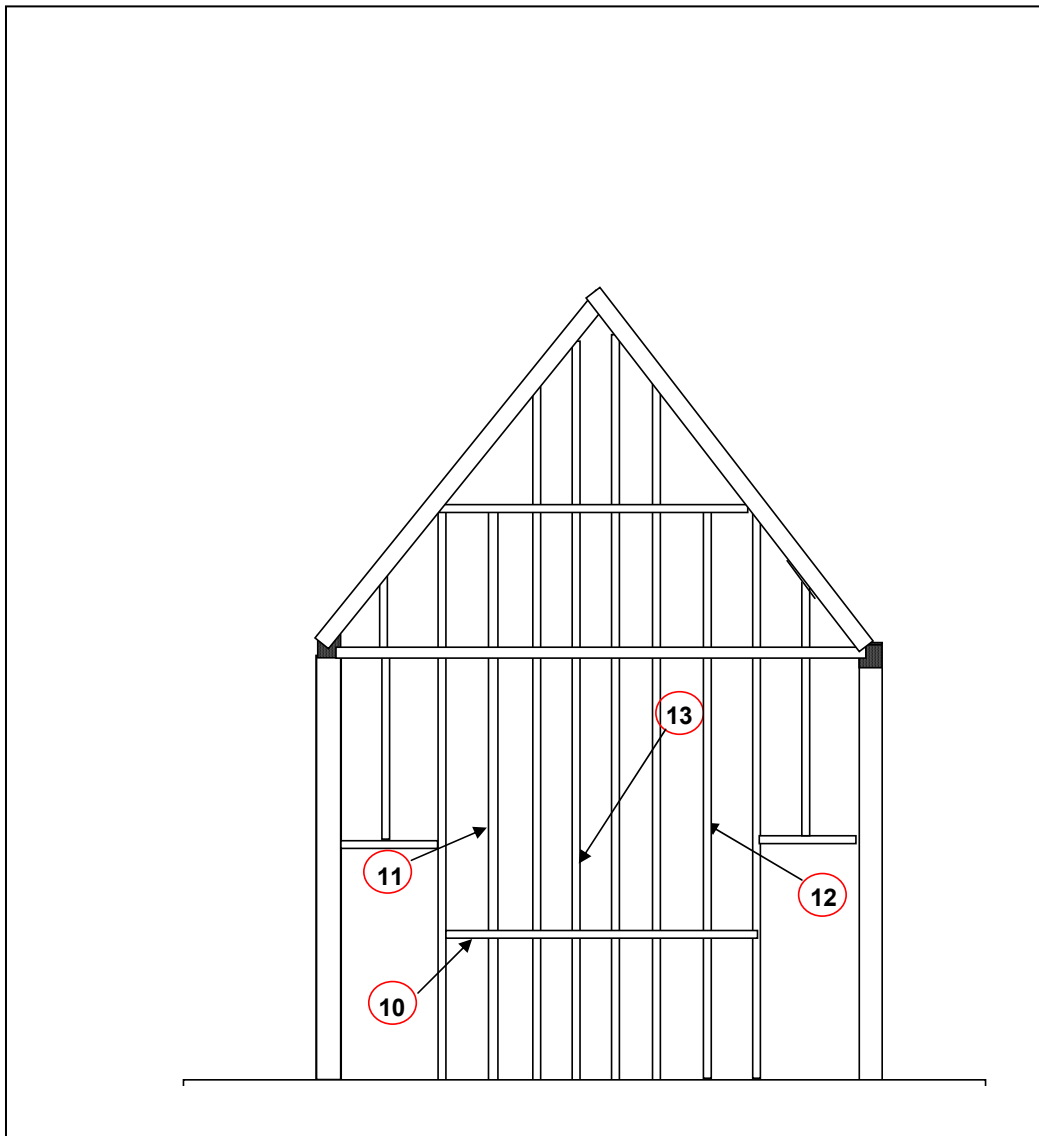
Sketch drawing of truss 28, in the solar range, to show sample locations (viewed from the south looking north)
